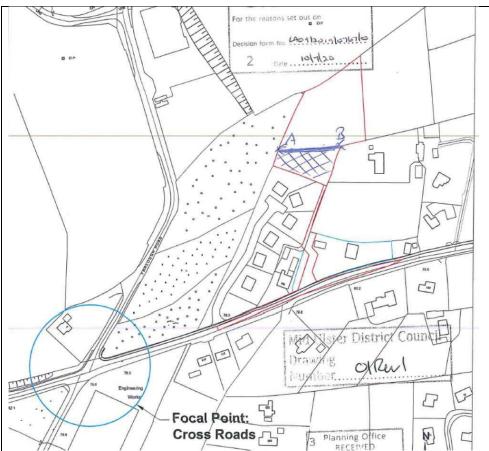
Screenshot of the stamped approved site location plan from LA09/2019/0767/O
